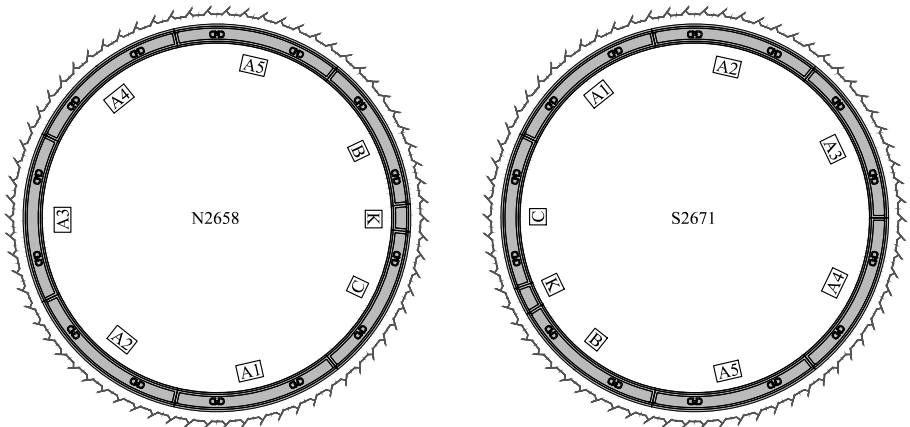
Segment orientation in tunnel sections N2658 and S2671.
